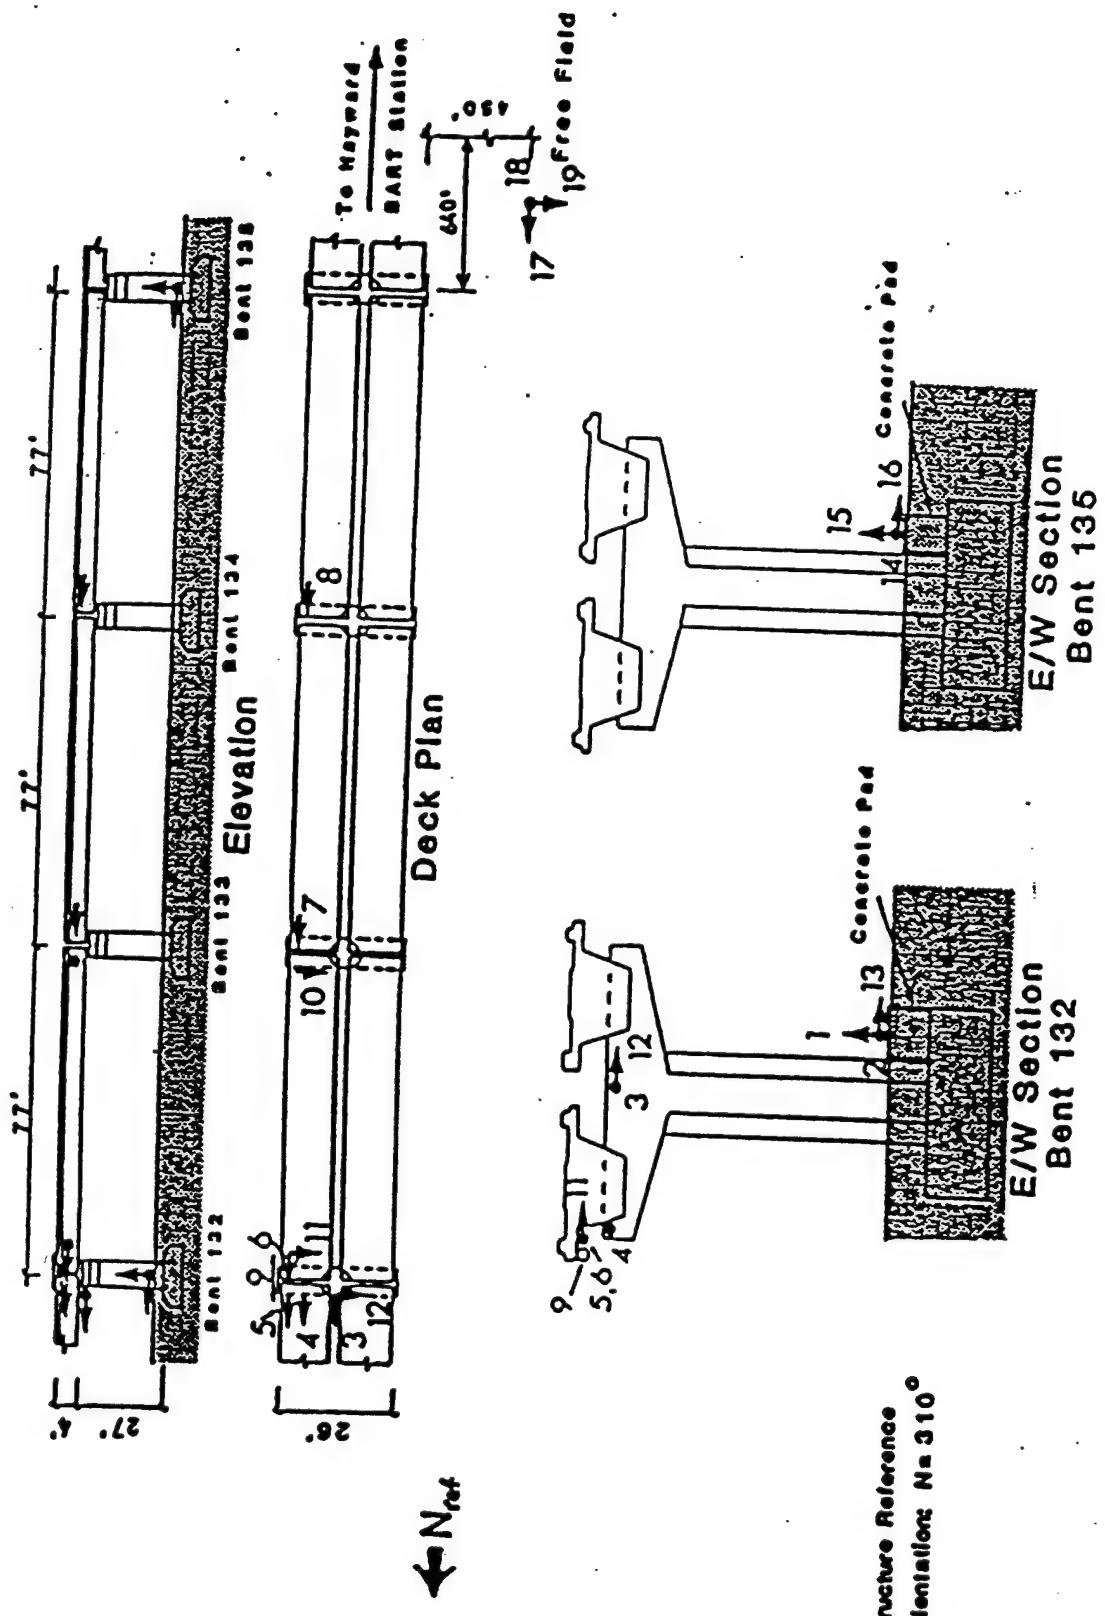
Instrumentation Locations on the Hayward-BART Elevated Section
